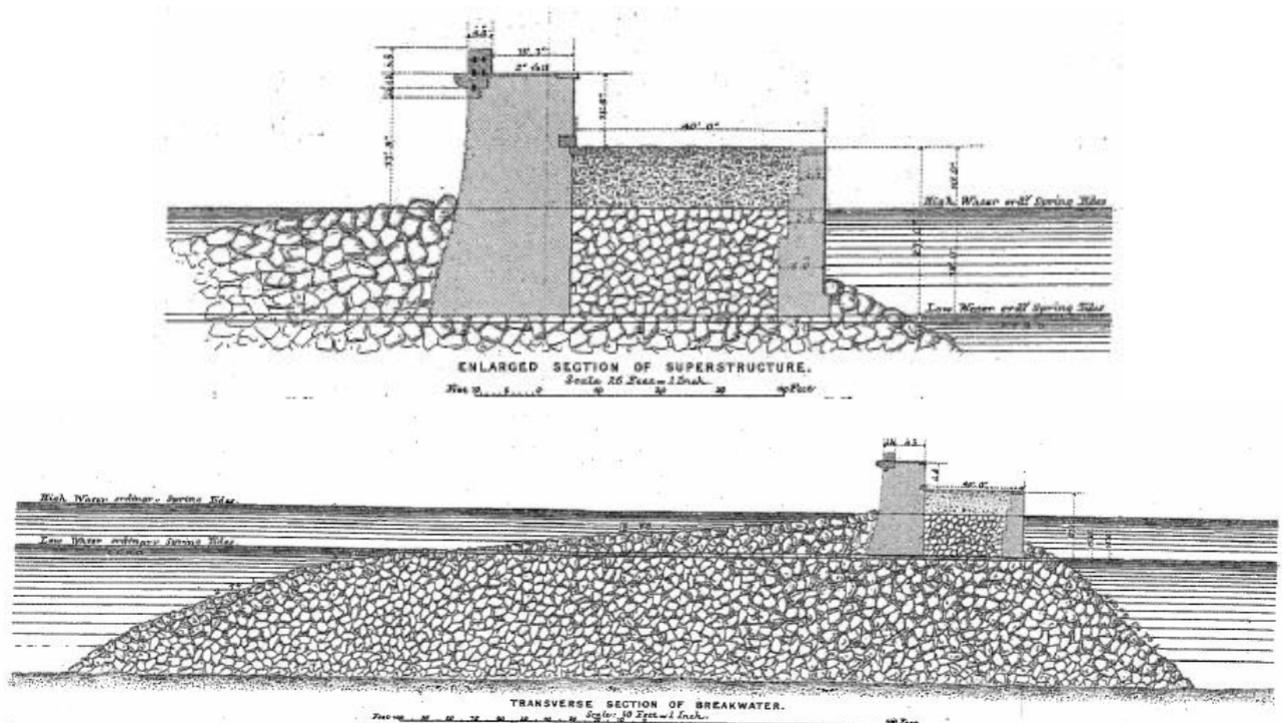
As built cross-section through Breakwater (Hayter, 1876)
